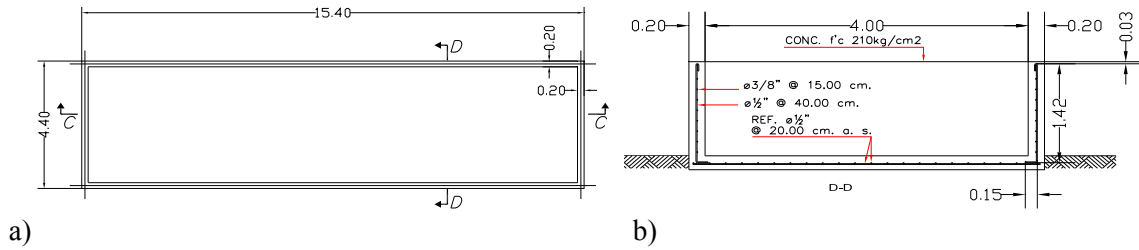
Design of the drying tank, a) Planimetry of drying tank, and b) Section D-D in Figure 24a
